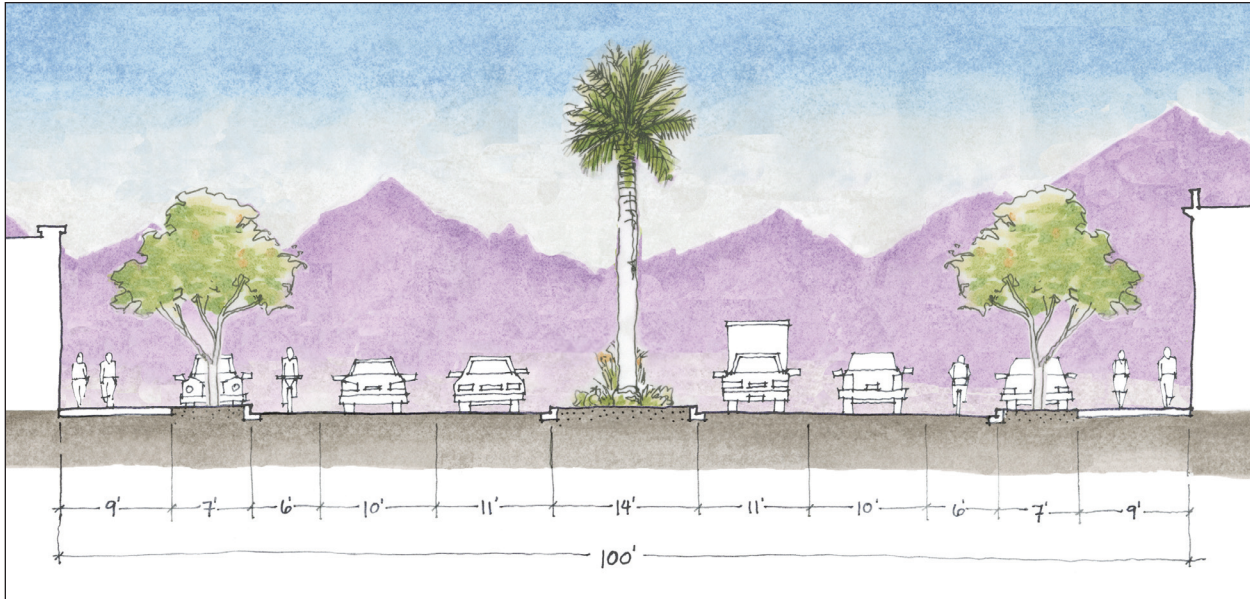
Harrison Street from Avenue 50 to Westerfield Way/1st Street looking north – Proposed Option 1
